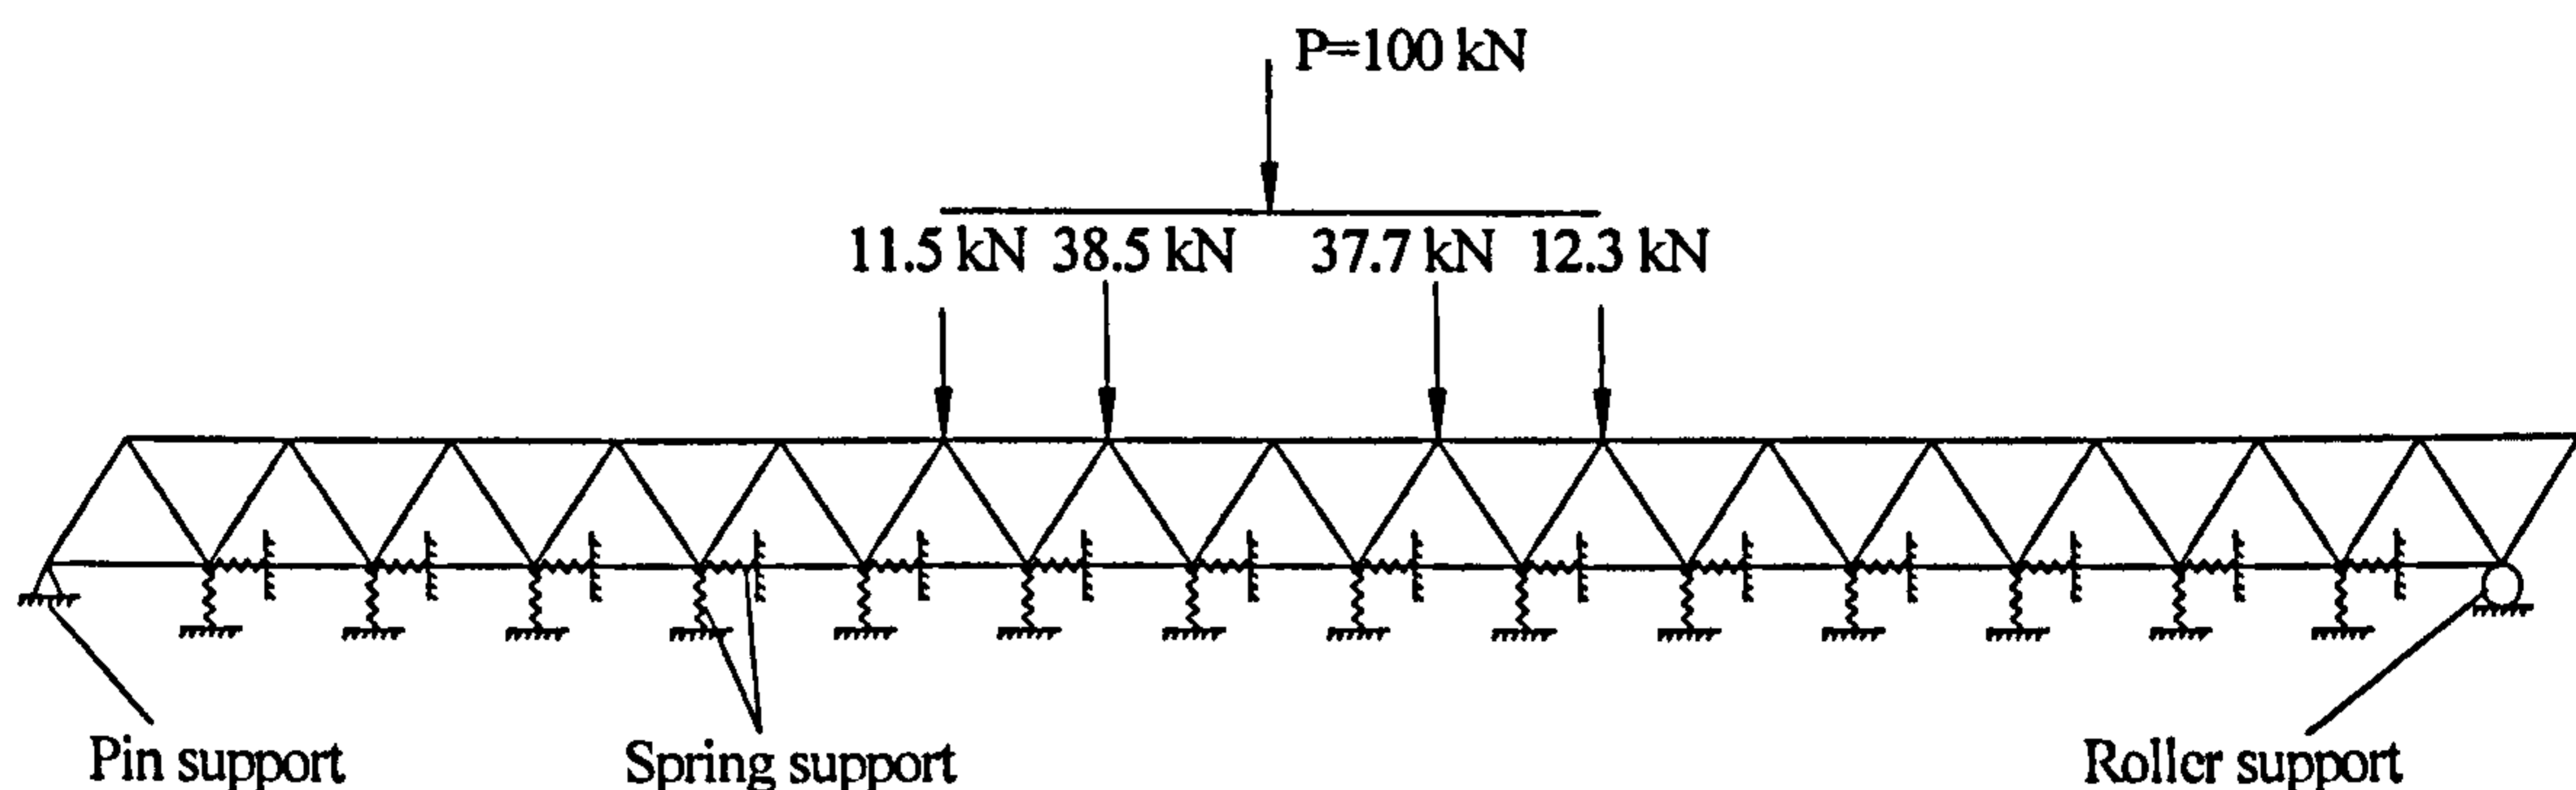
Modelling of GFRP deck using two-noded beam element
